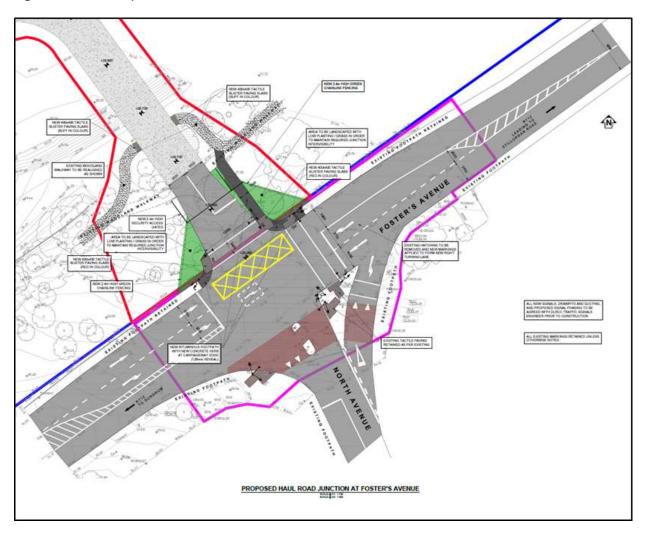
Proposed Construction Access/Fosters Avenue Junction
